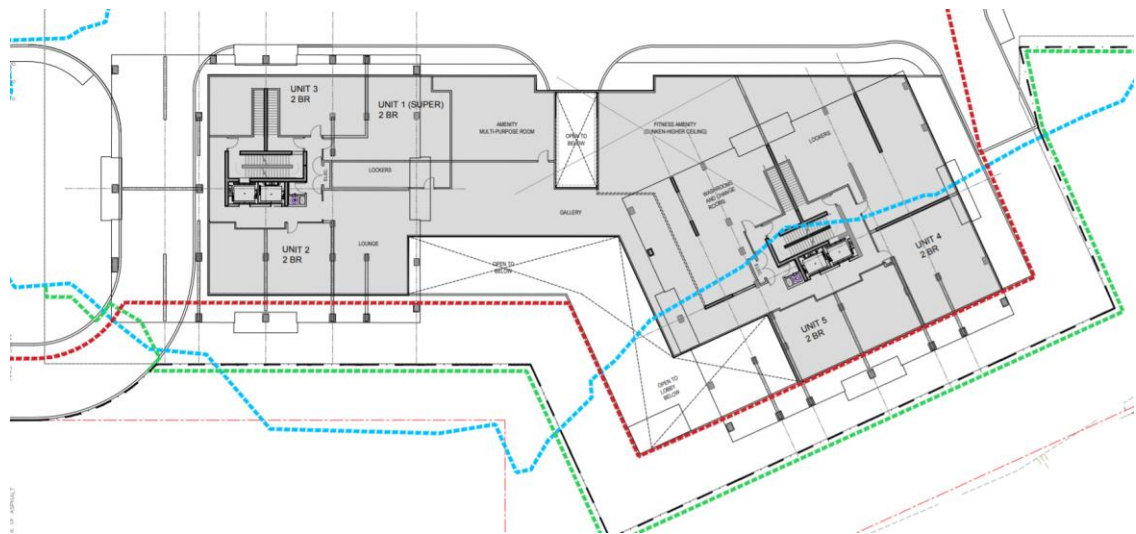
Proposed Second Floor Plan of Podium, Prepared by IBI Group
